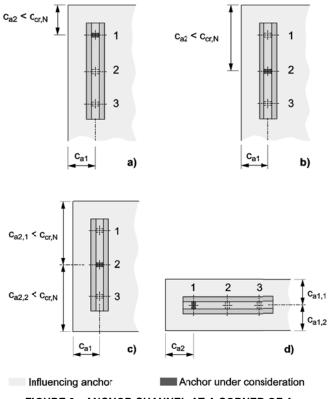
ANCHOR CHANNEL AT A CORNER OF A CONCRETE MEMBER
